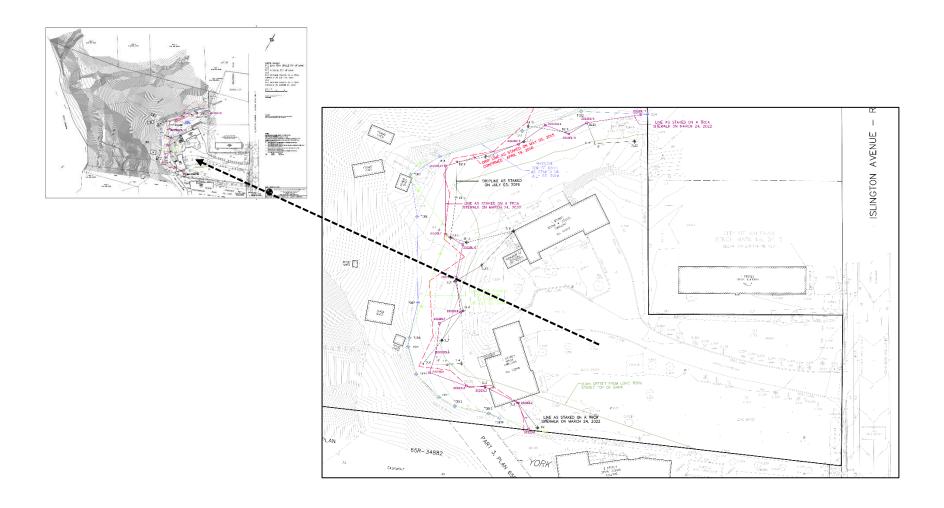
Site Plan (FBP Architects Inc., August 10, 2023)
